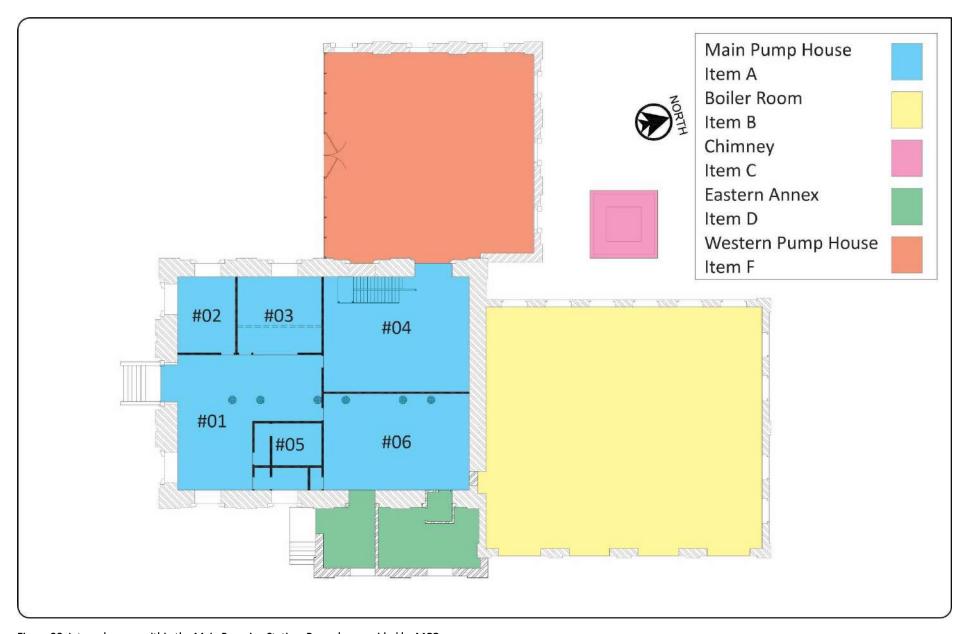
Internal rooms within the Main Pumping Station. Base plan provided by MCC
